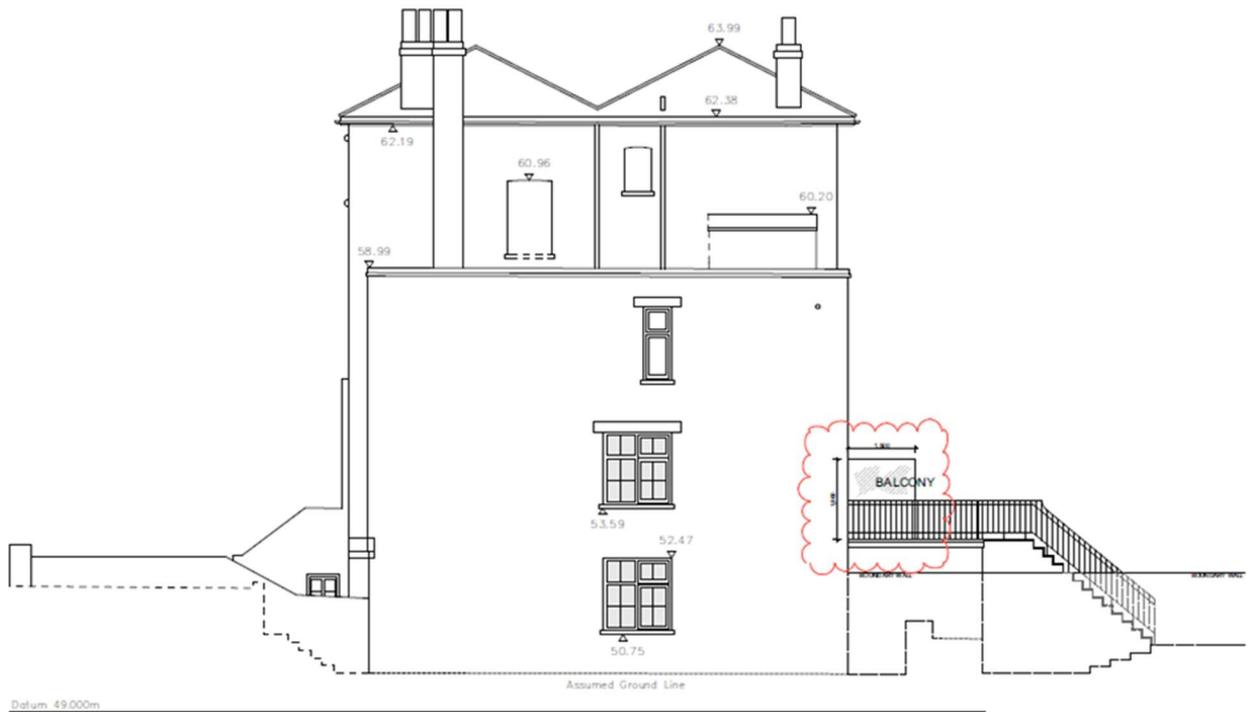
Proposed Front and Side elevation (with relocation of staircase)
